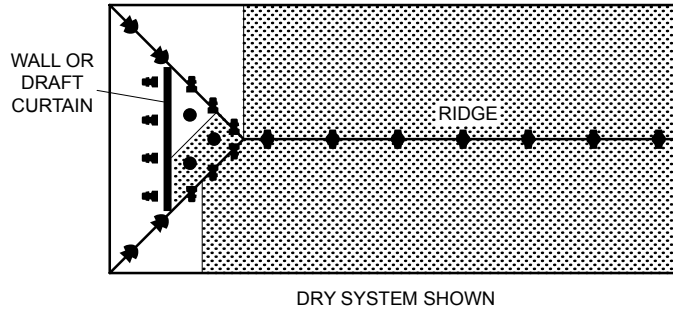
C-4. BB Sprinklers, SD Sprinklers, HIP Sprinklers, & Standard Spray Sprinklers At The Hip
